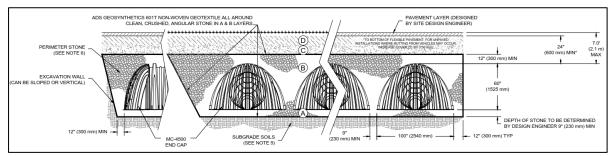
Stormtech Standard Detail (Extract from Stormtech MC-4500 Leaflet)
